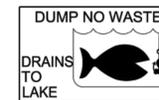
PLATE SHALL BE ADDED TO STORMWATER INLETS AS REQUIRED BY THE CITY.
